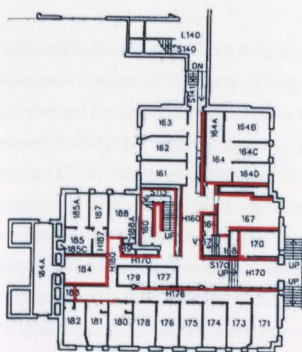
FIRST FLOOR COMMERCE HALL.
